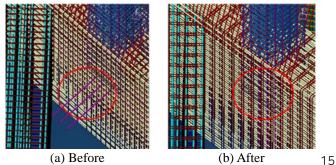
Modifying anchorage of longitudinal reinforcement of column located above transfer wall
